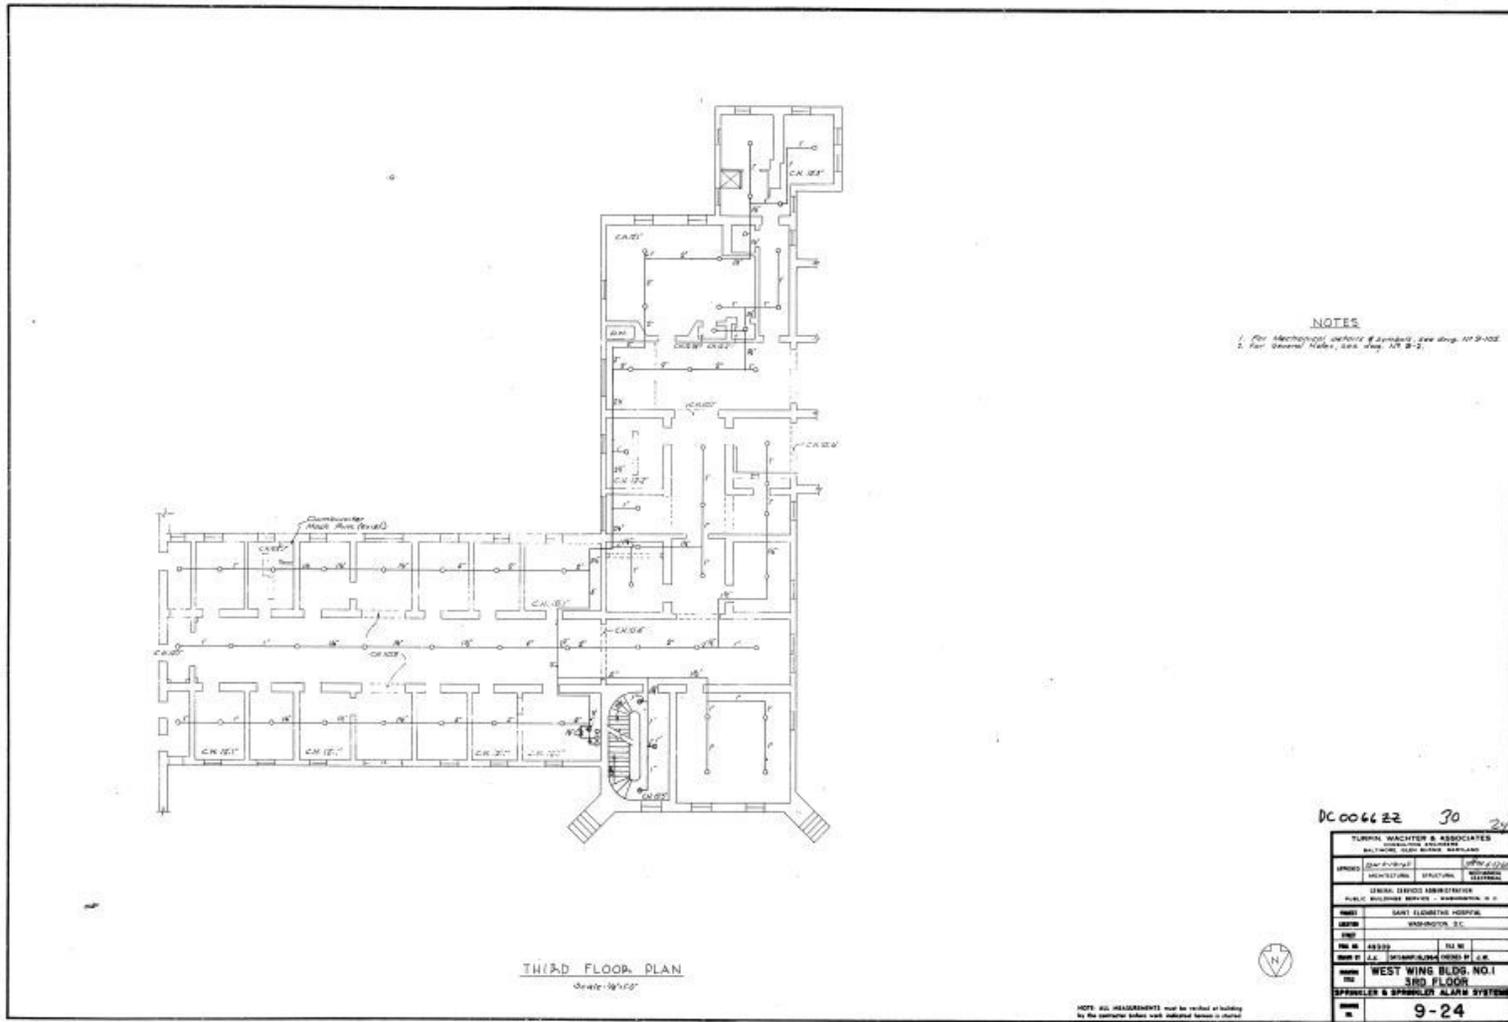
Third Floor Renovation Plans, West Wing, 1964. Source: GSA archives, image DC0066SE0030.
